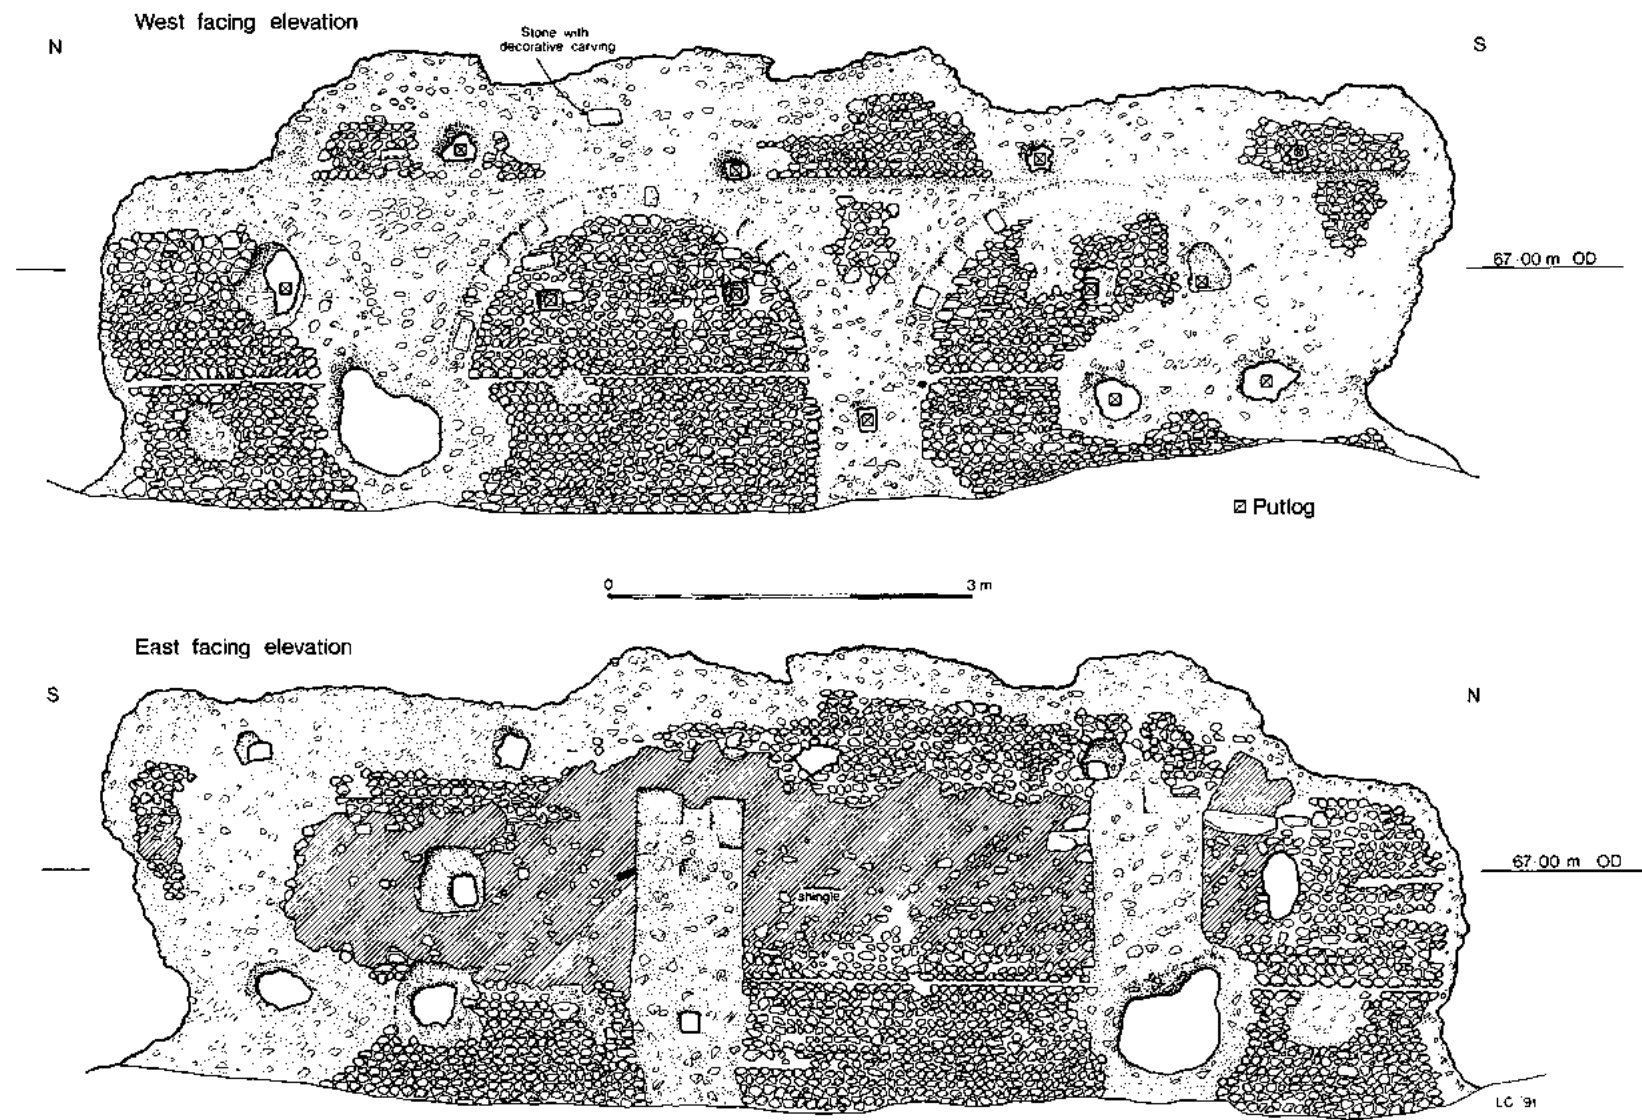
Tilty Abbey. East wall of west range; detailed elevation of the southern section.
